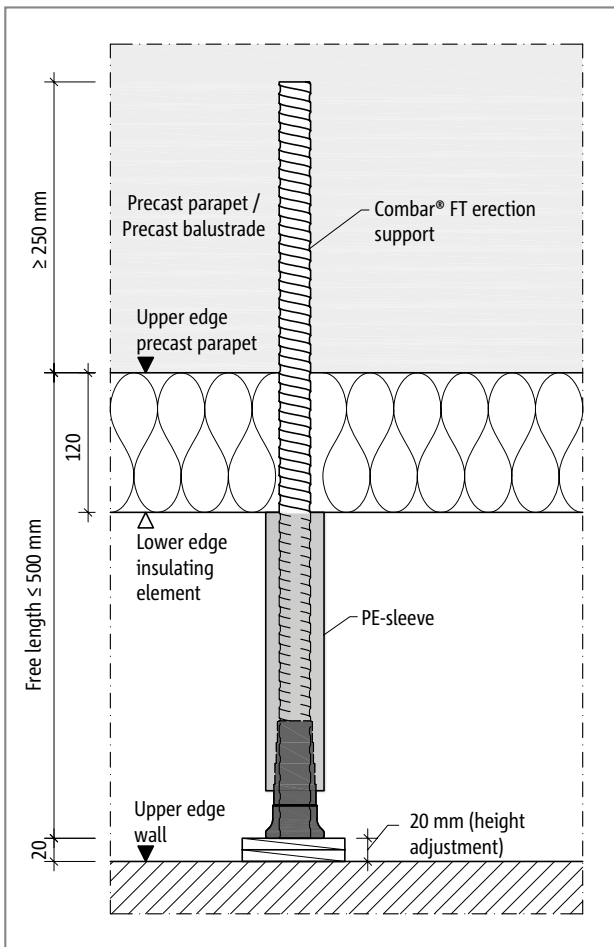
Schöck Combar® FT erection support: planning dimensions
